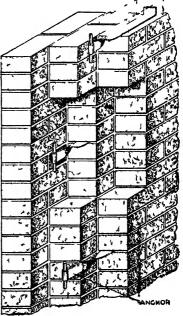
336—End of 8 in inside wall showing method of building anchor into the wall
